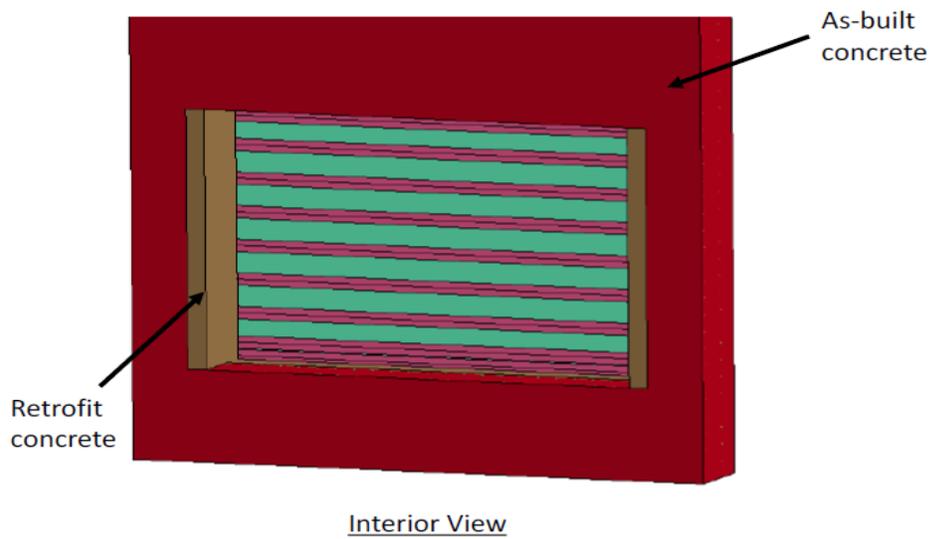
Interior view of the added retrofit precast block attached to the pilasters at either end
